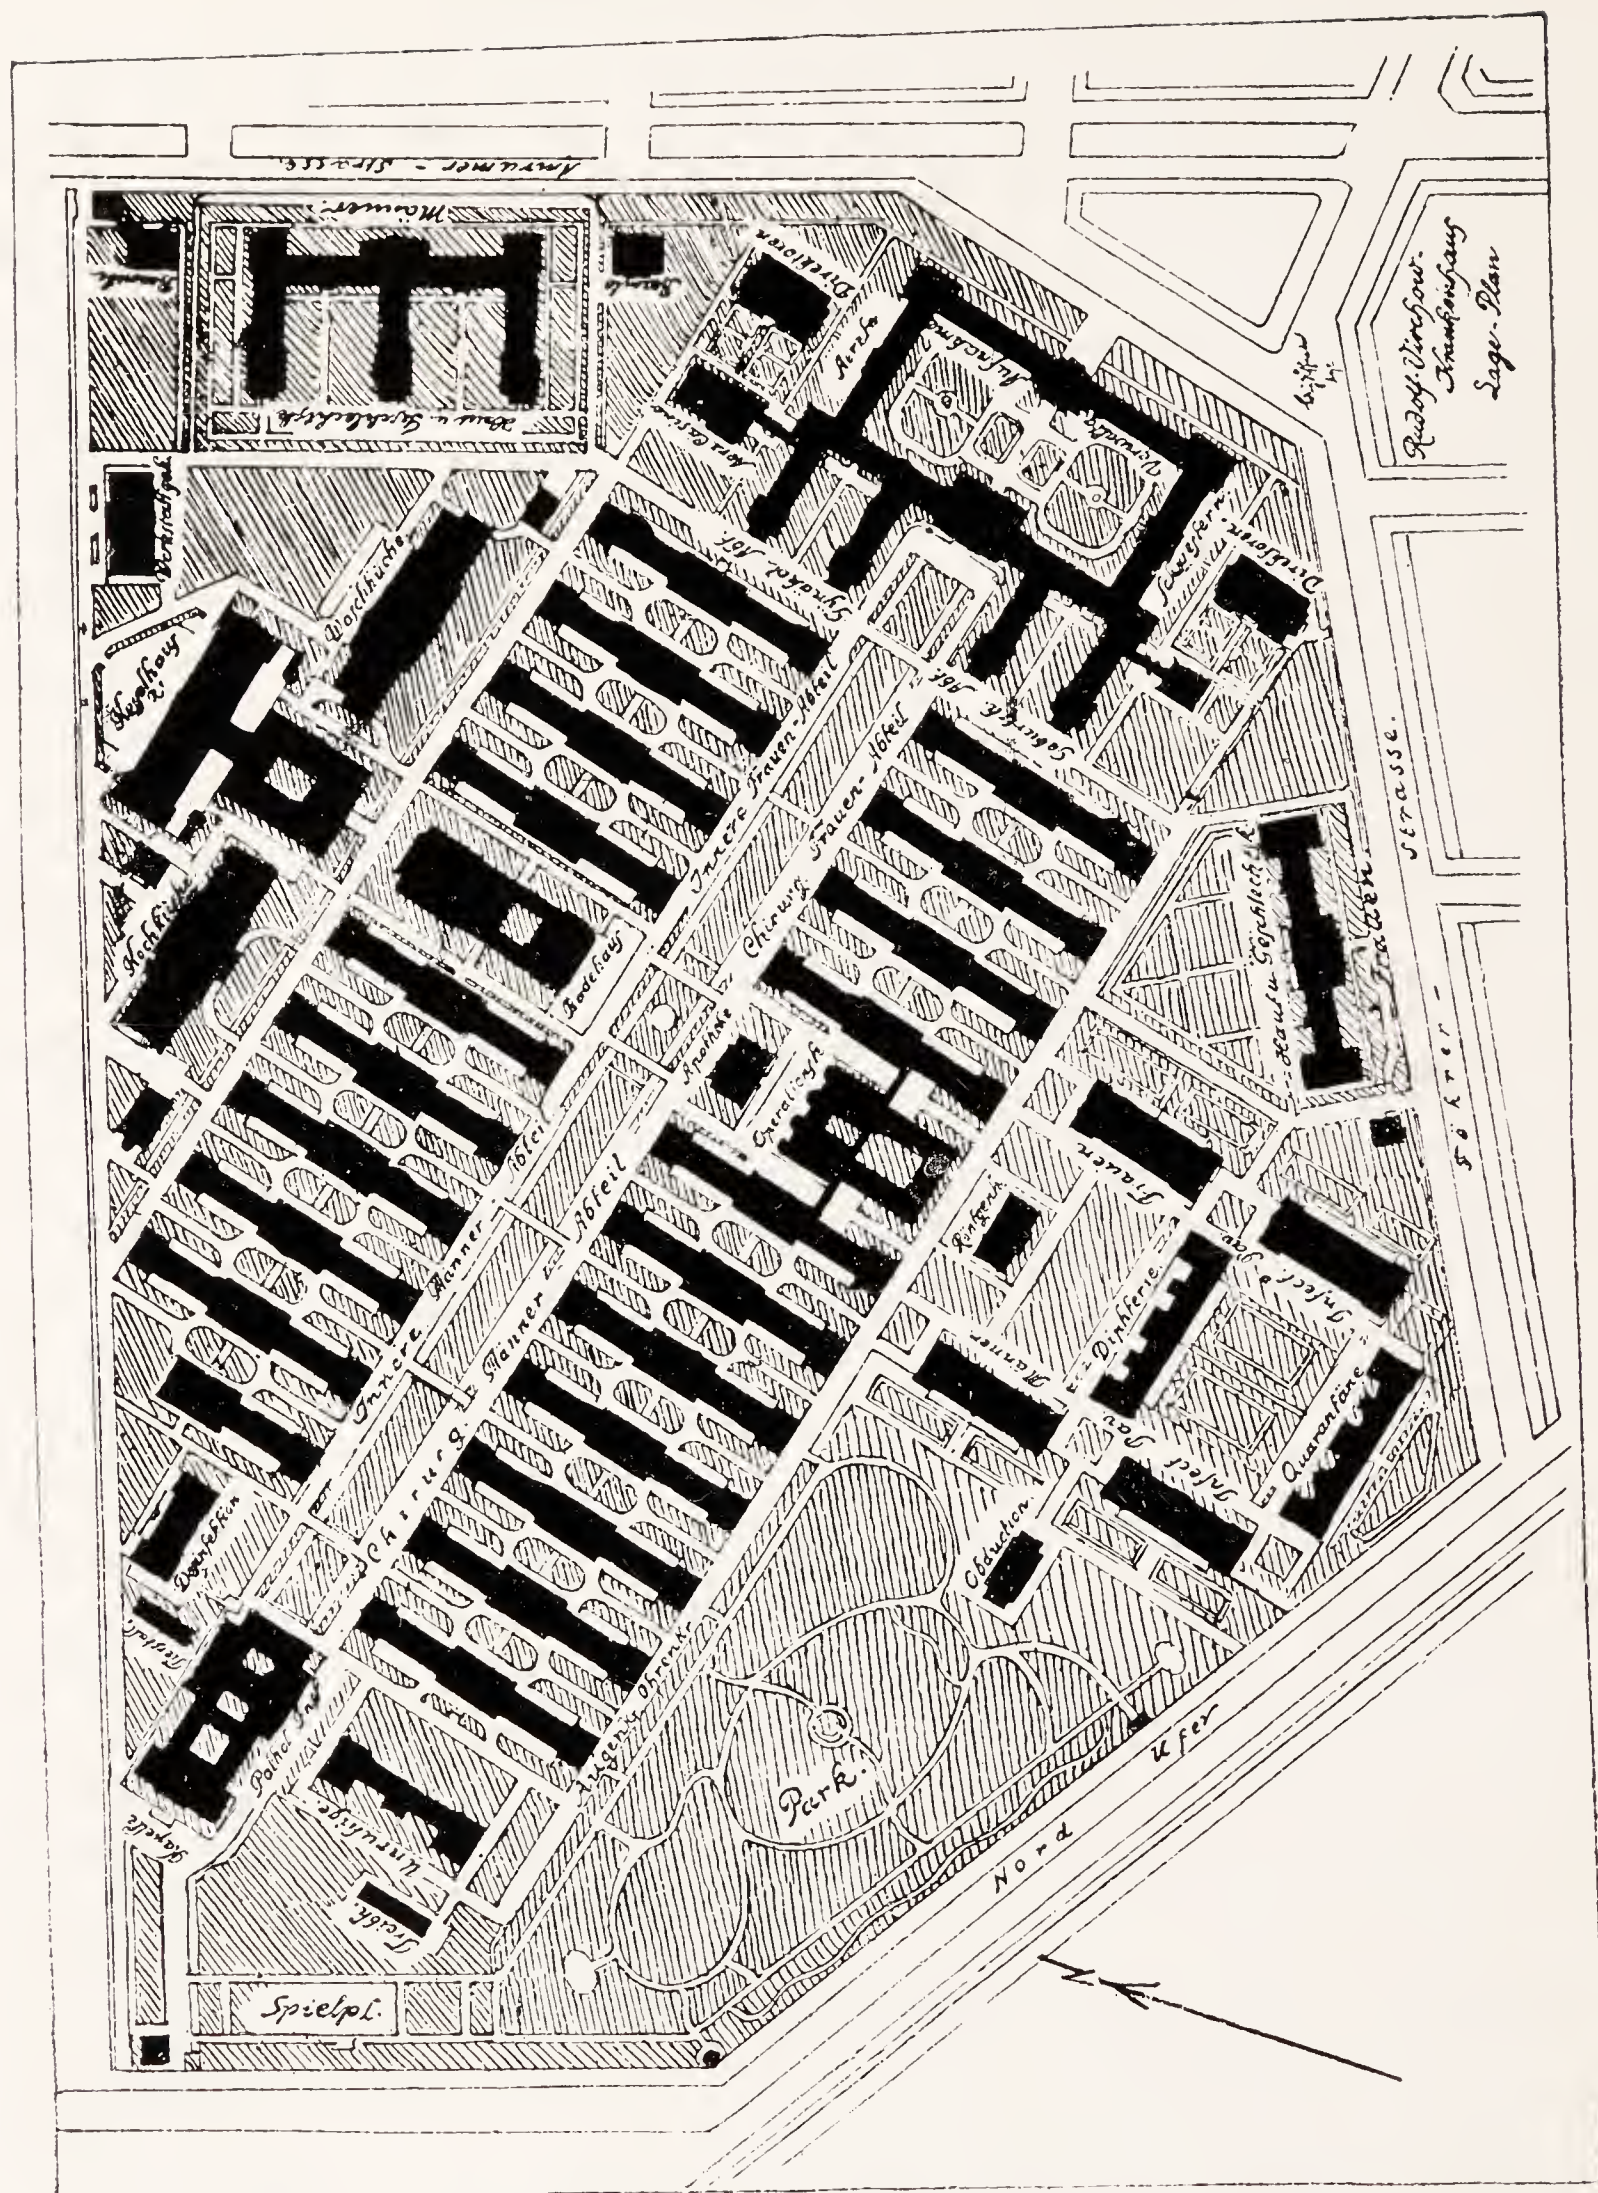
PLOT PLAN, RUDOLPH VIRCHOW HOSPITAL, BERLIN, GERMANY
